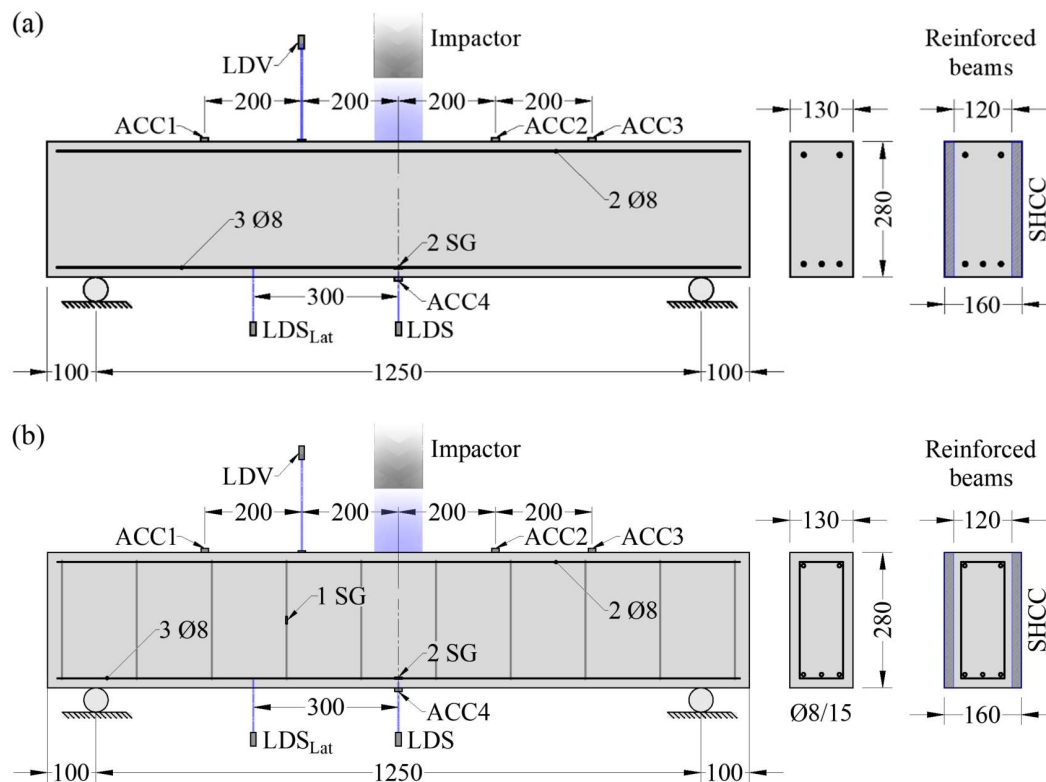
Geometry of the RC beams, layout of the steel reinforcement and location of the embodied instrumentation: (a) Beams without stirrups (Se); (b) Beams with stirrups (Ce). Dimensions in mm.
